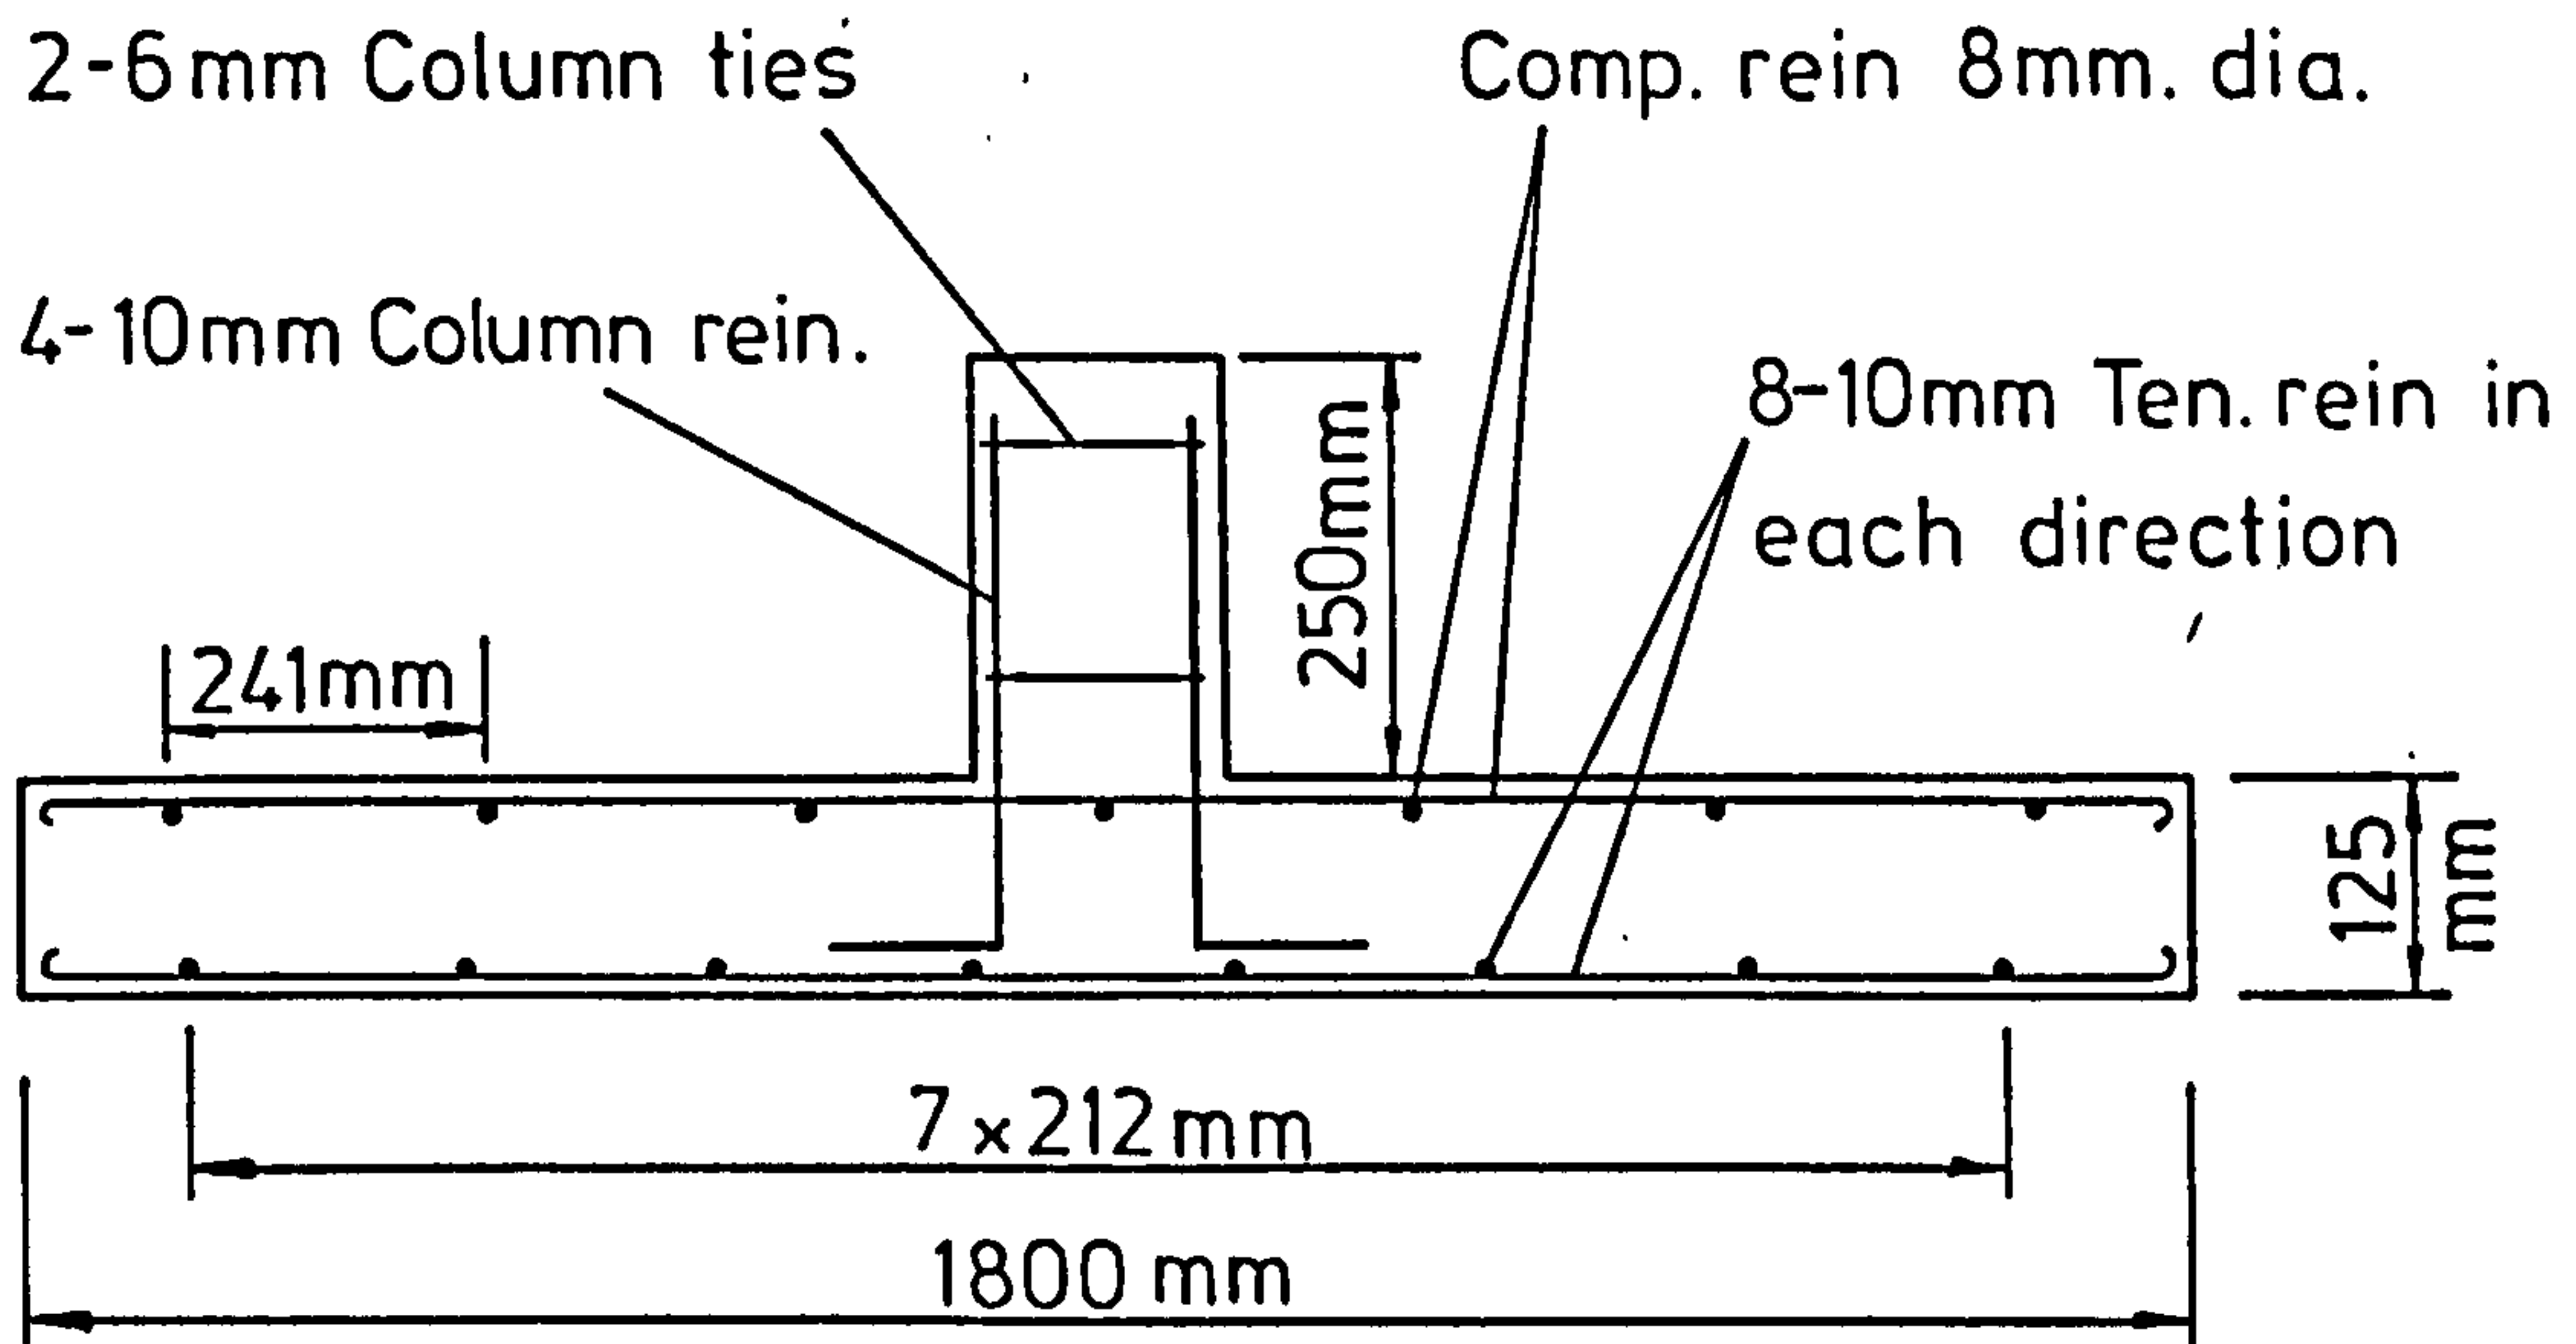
TYPICAL ARRANGEMENT OF STEEL BARS IN SLABS WITH 8-10mm TEN. REIN.
